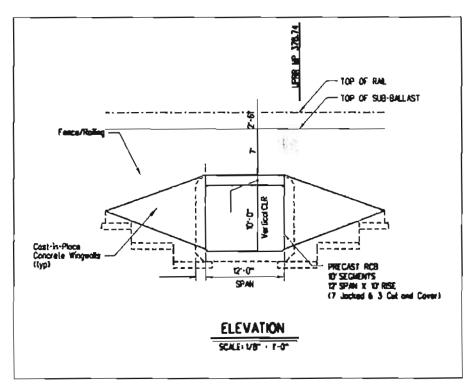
Reinforced Concrete Box Tunnel Elevation View (Typical)
